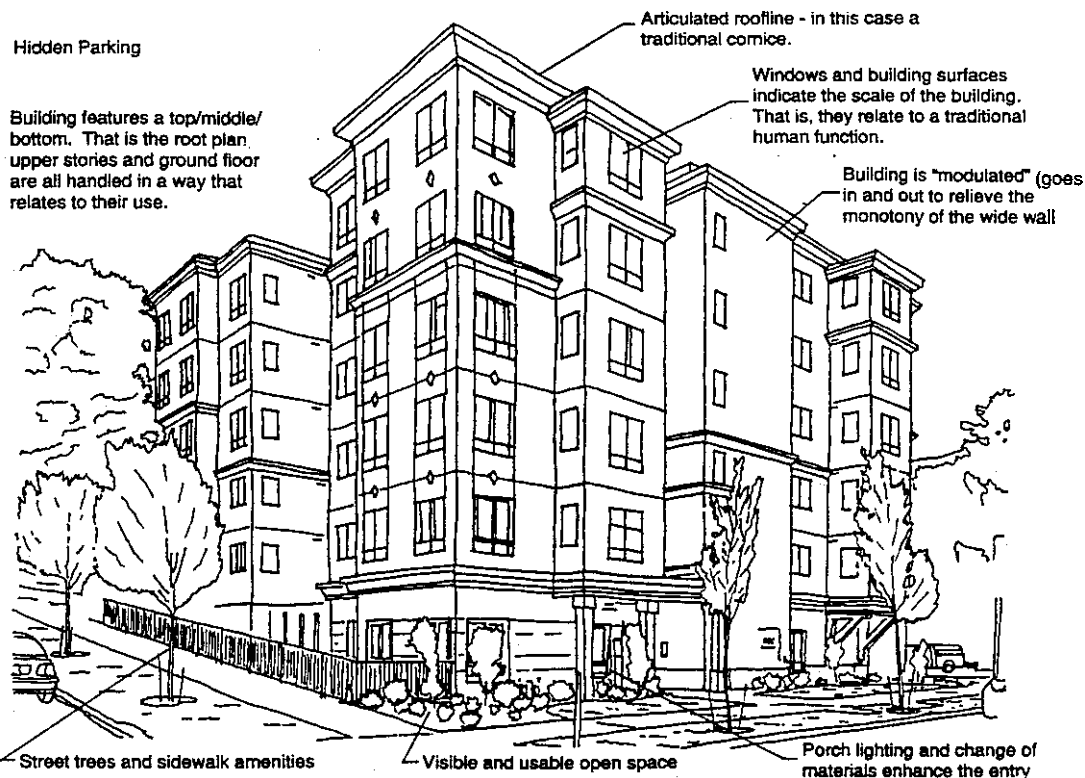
This contemporary "Decorated Block" midrise residential building illustrates positive design features.
